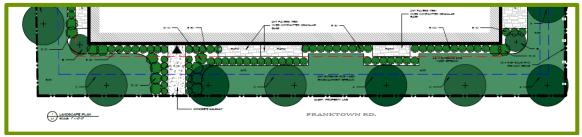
LANDSCAPING ADJACENT TO FRANKTOWN ROAD
